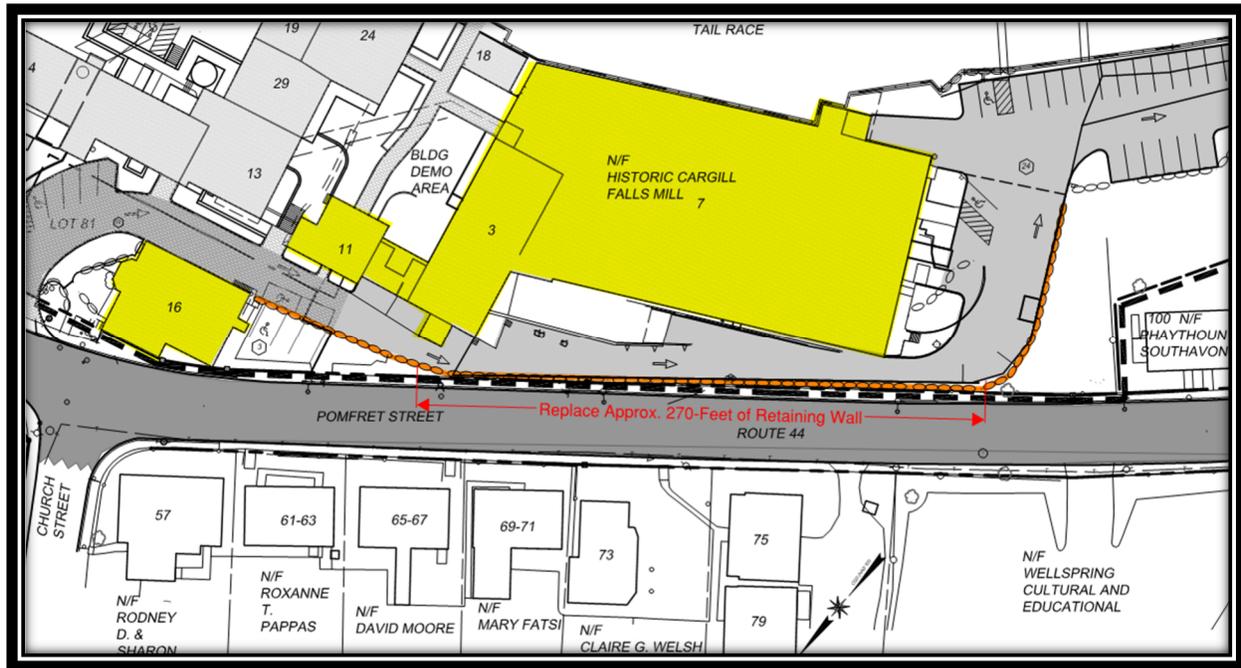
Plan from Cargill Mills Falls MTG Showing Wall and Building Proximity
